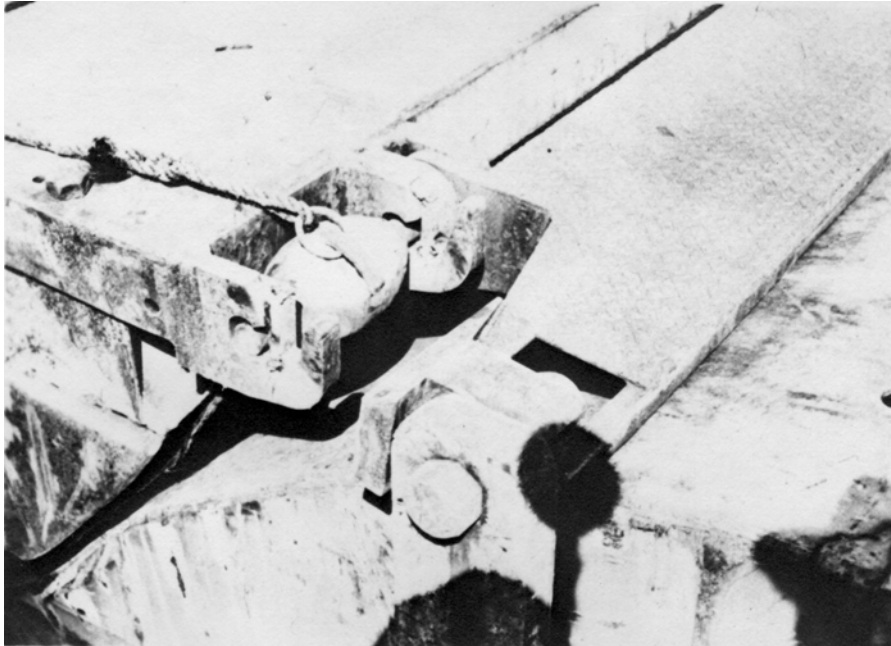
Ball sockets fixed in place in the open clevis brackets with welded steel keepers.
